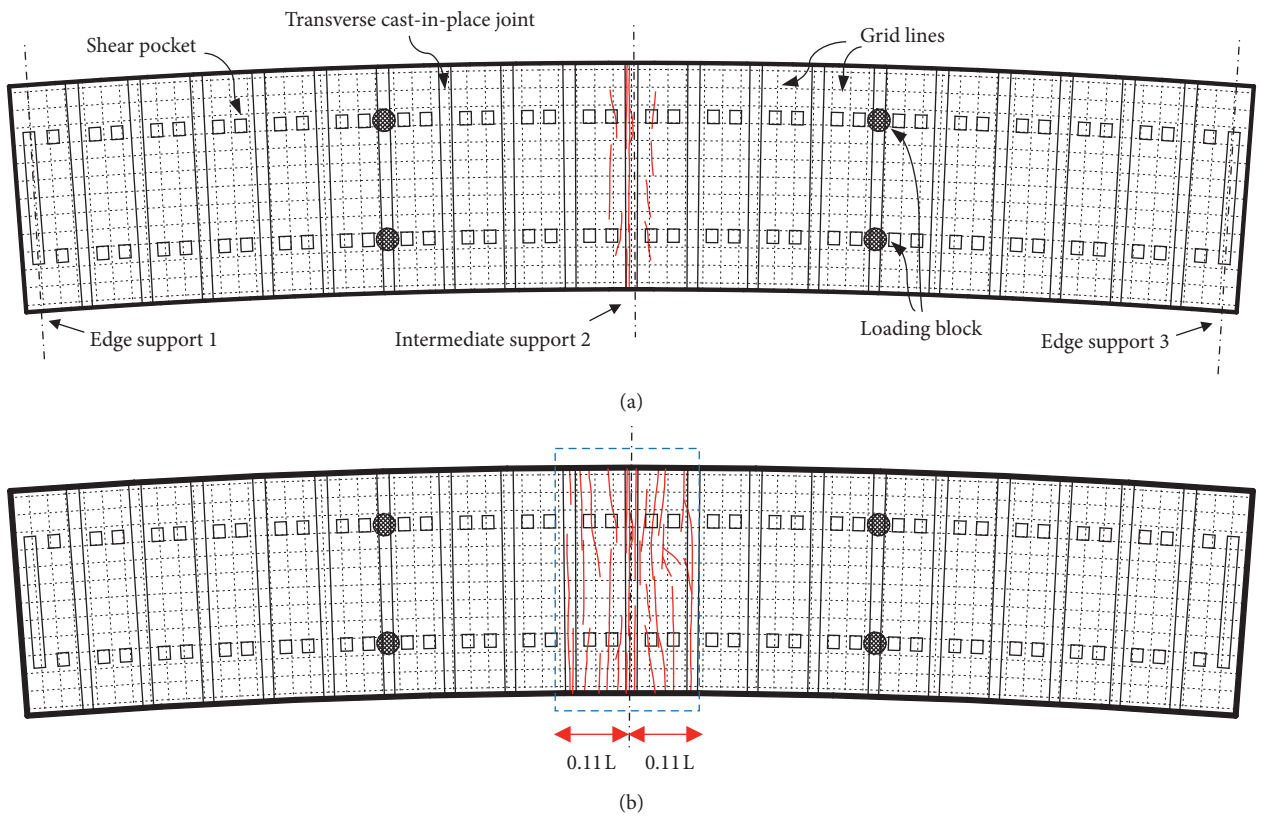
Schematic diagram of the concrete slab cracking process and distribution. (a) Cracking distribution under 140 kN loading force. (b) Cracking distribution under ultimate failure.
